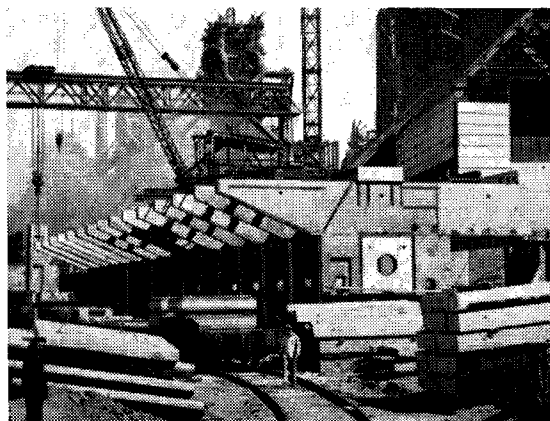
The blast furnace bunker trestle of precast reinforced concrete units.
